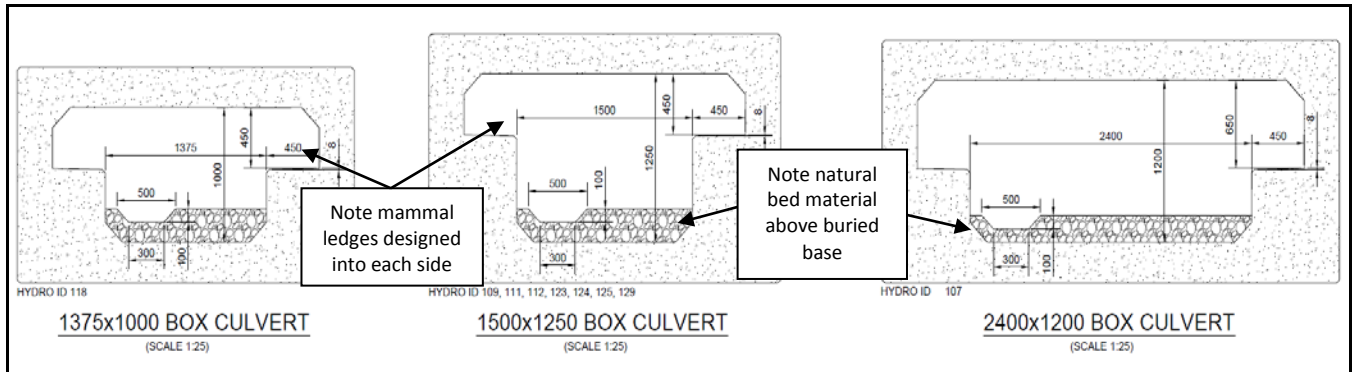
Typical cross-sections of buried box culverts with bed material and mammal ledges
